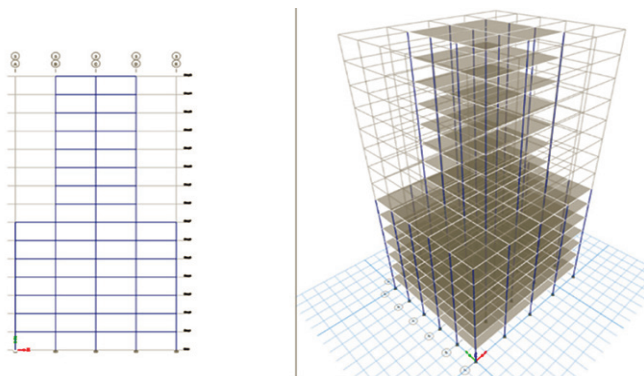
Views of the Vertical Geometric Irregular-2 Model in elevation and 3D for both composite and RC buildings
